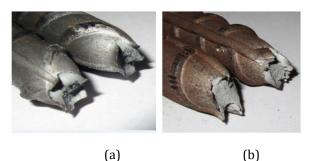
Optical macrograph showing the fracture mode of TMT steels (a) 1 and (b) 2
